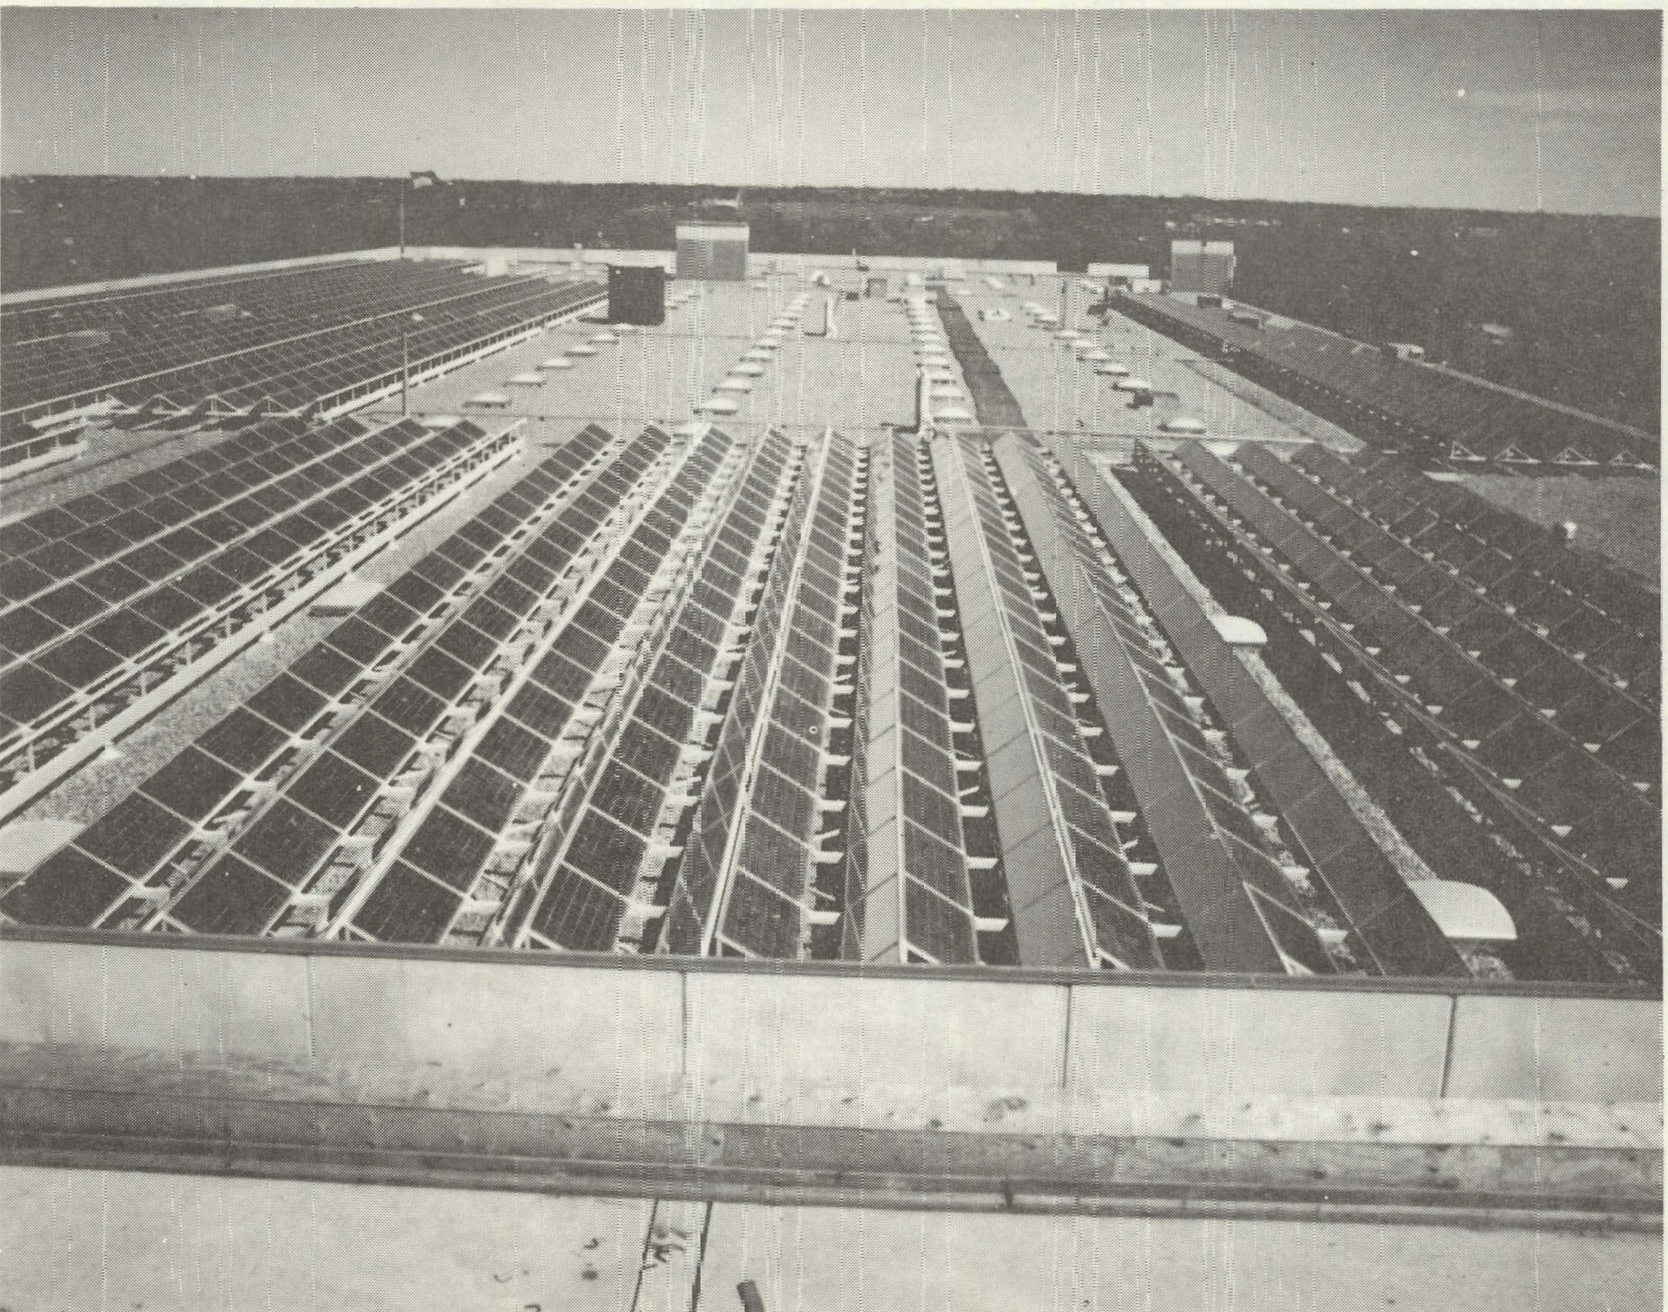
Roof Top View Looking East of the 140 kW_p Installation at Oklahoma Center for Science and Arts
